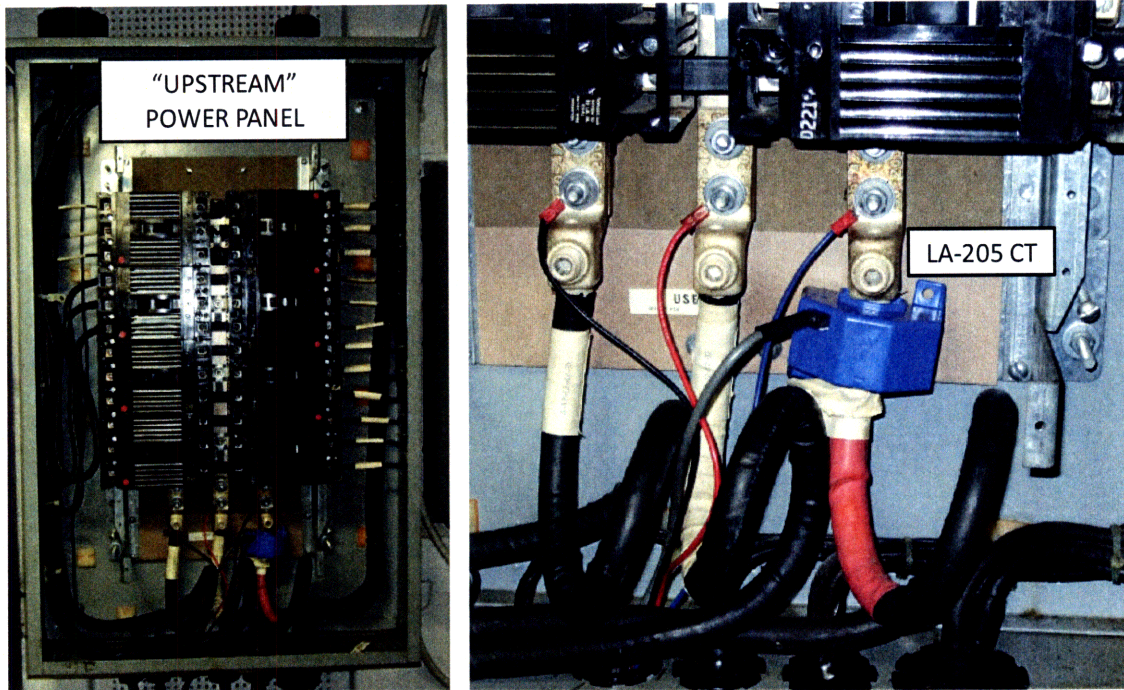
Interior view of P-2-282-3 (left) and close-up view of bottom portion of panel (right).
